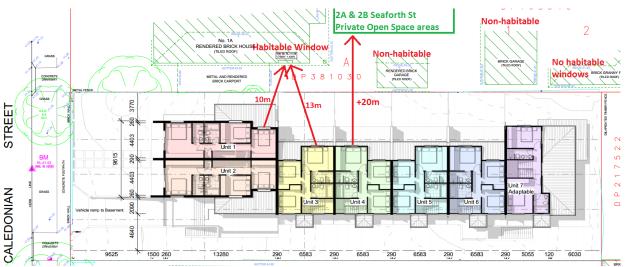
First floor plan overlaid on survey plan indicating privacy interface to north-eastern side (Source: The Site Foreman, 2017; Peak Surveying Services, 2016; CPS, 2017)
